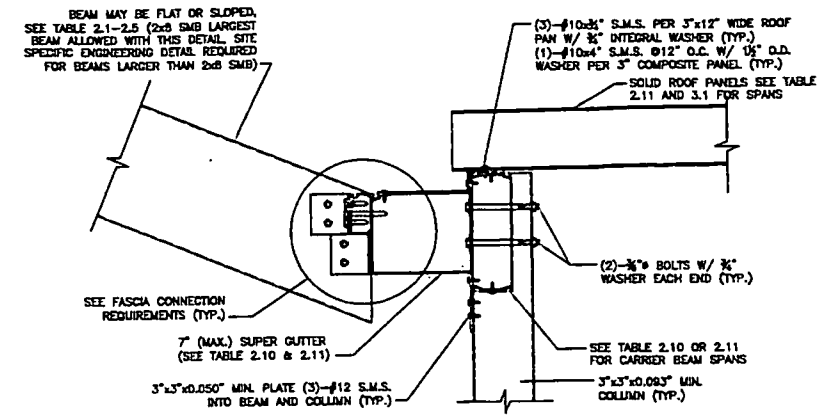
TYP. NON-GABLE ROOF TRANSOM (RISER) WALL
